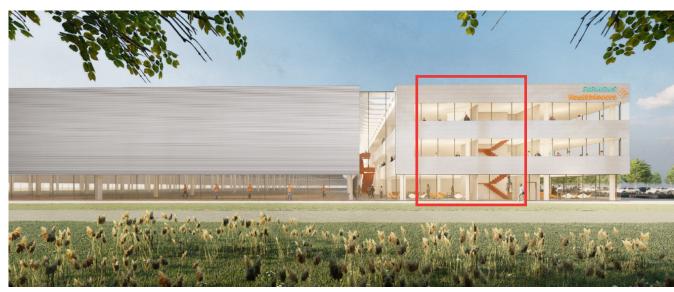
FIG. ARTISTS IMPRESSION - SPINE BUILDING
